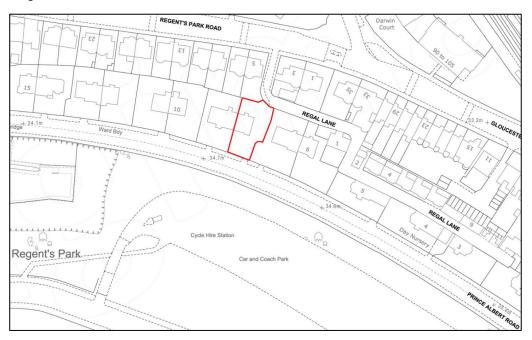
Site location plan for No. 8 Prince Albert Road
